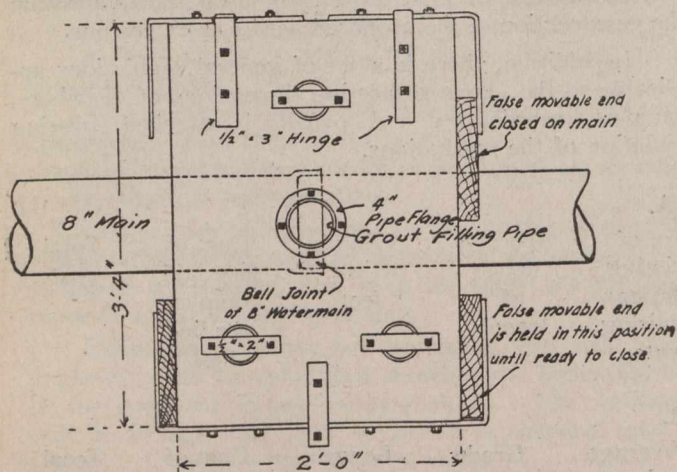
Top Plan of Form Used in Repairing Water Main.
